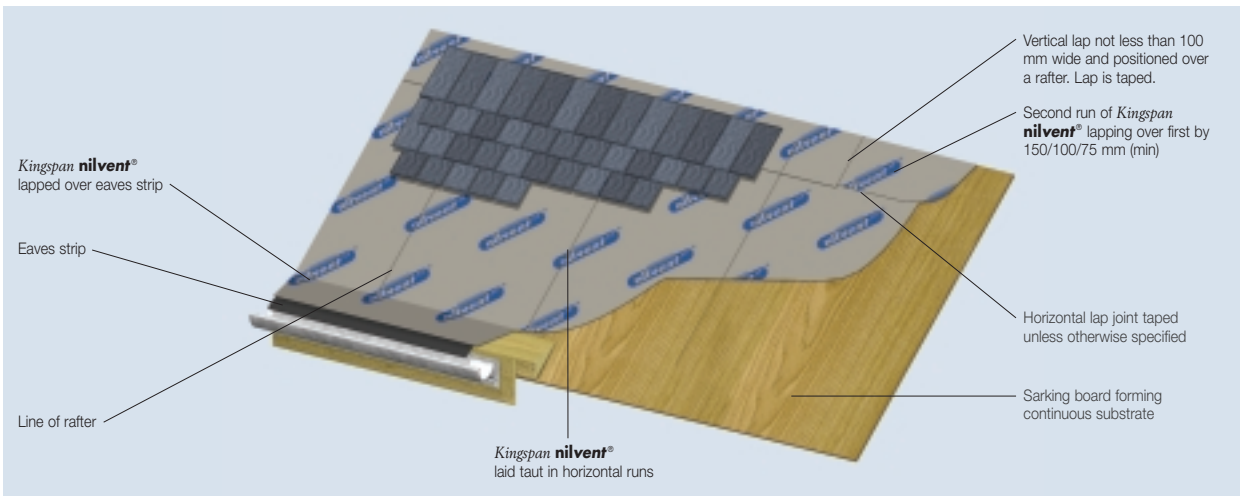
Eaves – Fully Supported Horizontal Installation with Natural Slates
